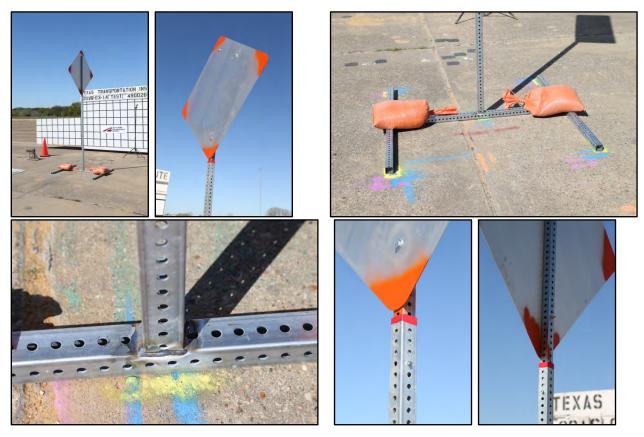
Option C Temporary Work Zone Sign Support Used for Test No. 490026-2-9.
